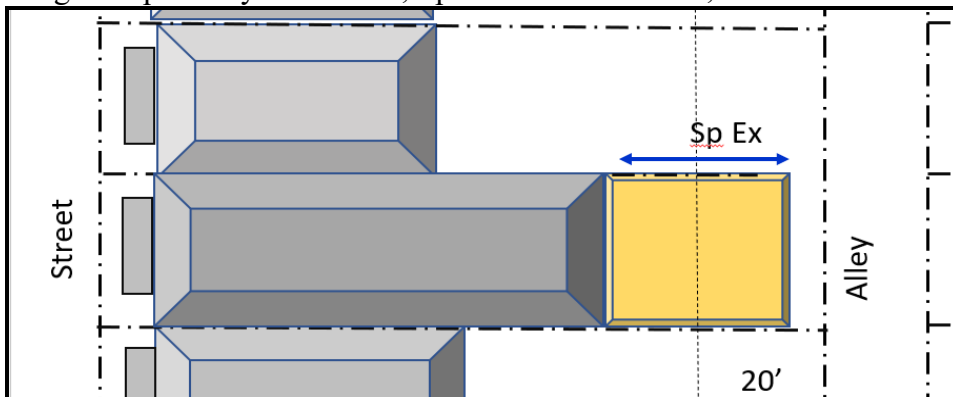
shows a scenario where the existing building already extends more than 16 beyond either adjoining rear façade and a proposed addition would extend into the required rear yard and exceed 70% lot occupancy. In this scenario the proposed addition would require 1) special exception relief to be constructed beyond 16 feet, 2) special exception relief to extend into the rear yard and 3) a variance to exceed 70% lot occupancy.
